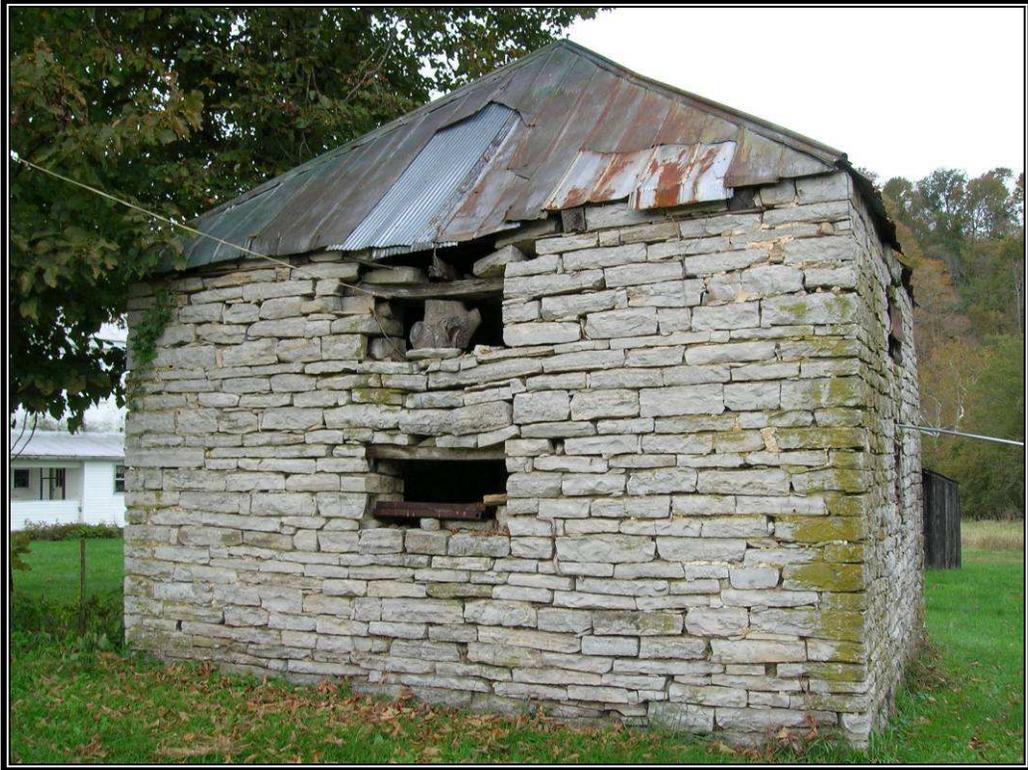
Site 30 Stone outbuilding, west elevation.
